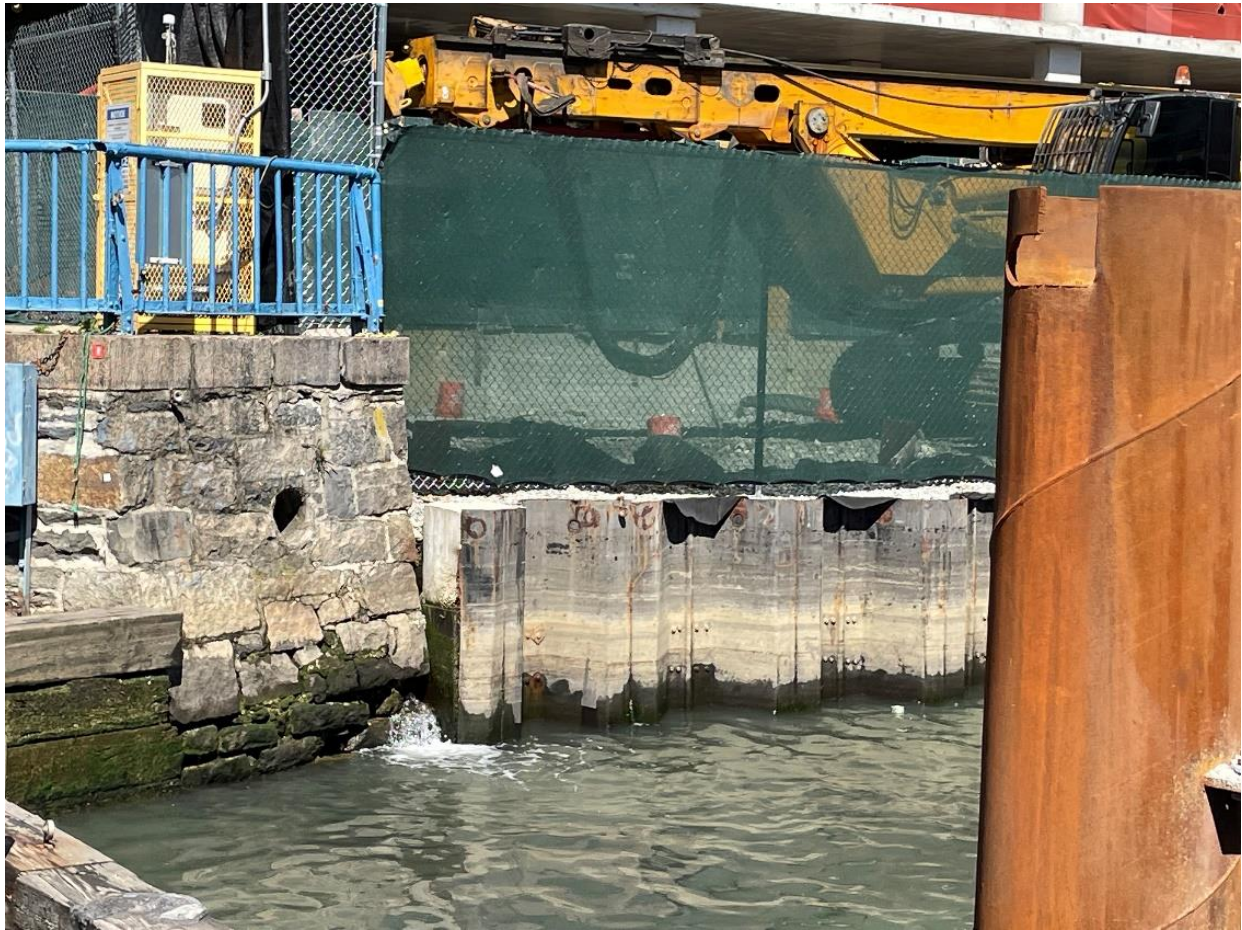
Discharge from the storm water outfall at the Bayside North construction site located between Union Street and Degraw Street on April 8, 2024 at approximately 11:25 AM.
